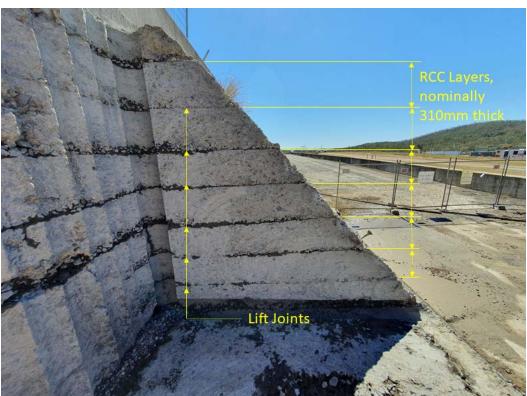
Photo showing RCC layers and lift joints in Paradise Dam (August 2020)
